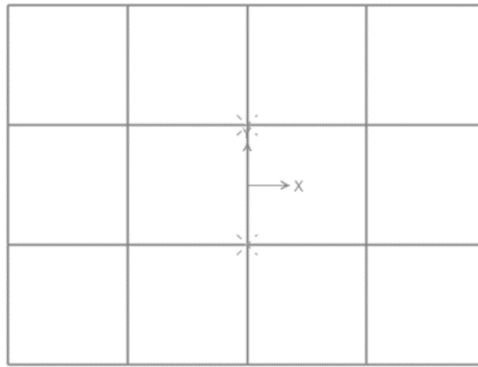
Selected symmetrical two inner columns to be deleted in the reference frame floor plan
